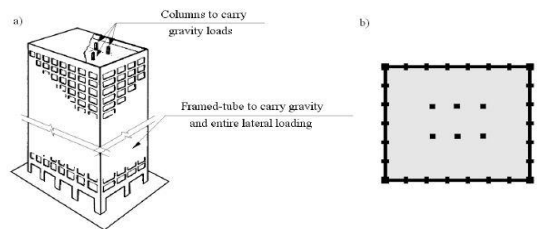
Framed-tube structure a) general view of structure b) floor plan of structure
